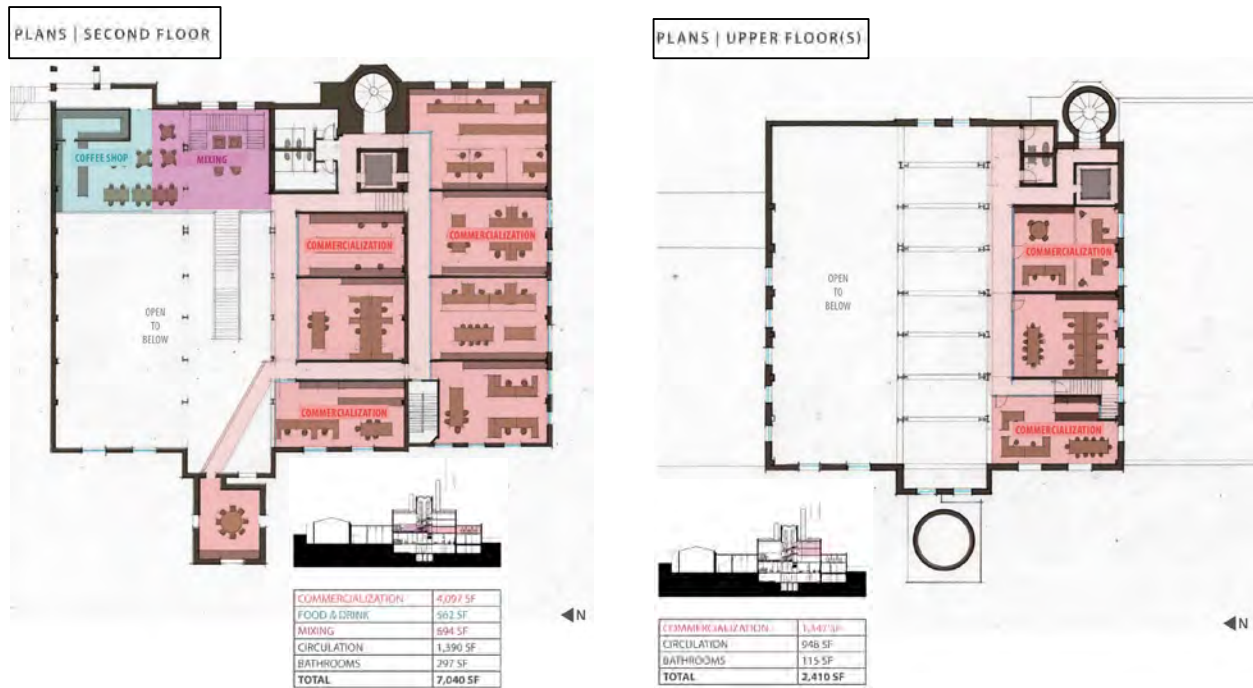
Conceptual Site Plan Space Program Summary by Floor
